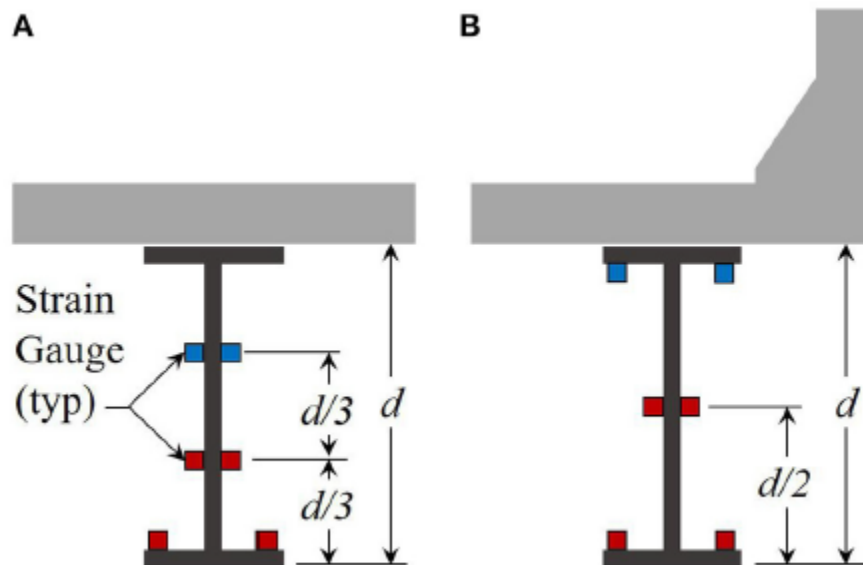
Recommended Strain Gauge Locations for (A) Interior Girder and (B) Exterior Girder with Symmetric Cross-Sections
